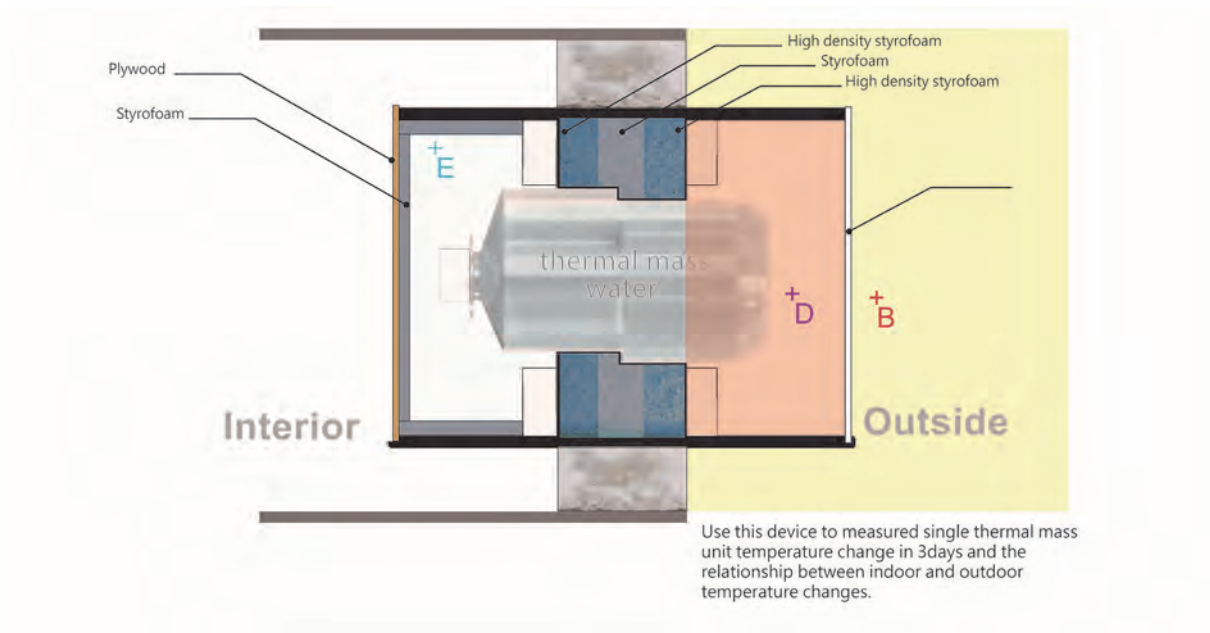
Thermal Wall Detail in Versailles
